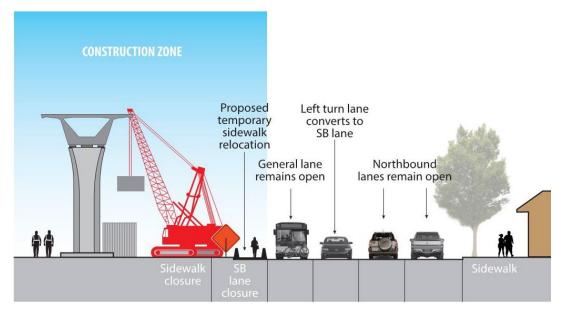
Construction of Elevated Guideway on Side of Roadway (Typical Cross Section)
